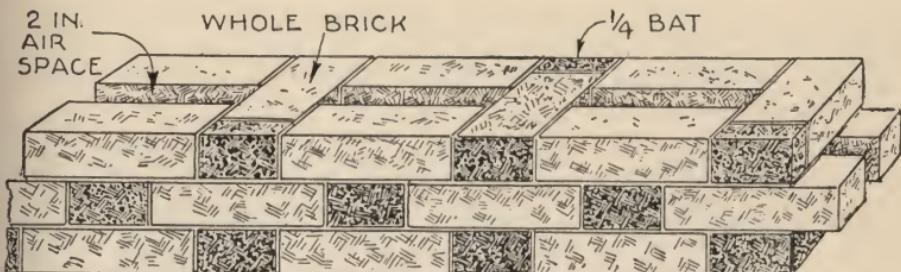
,115.—Hollow wall with single Flemish bond. Another construction would be to center the headers, filling the ends flush with mortar or leaving the spaces vacant, thus avoiding the cutting of bats.
